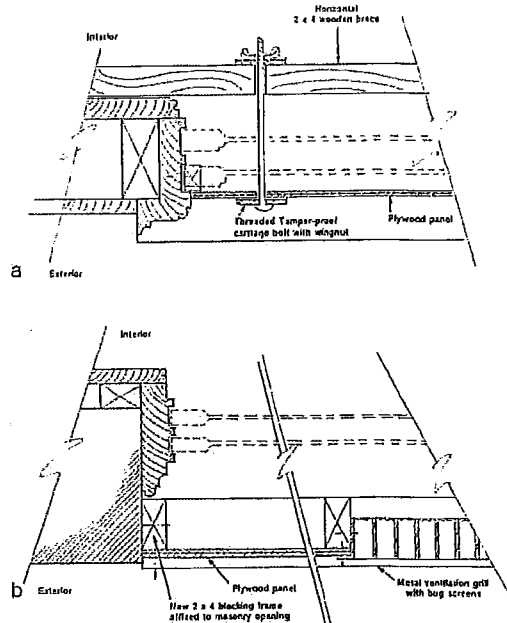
A: Plan detail showing plywood security panel anchored with carriage bolts through to the inside horizontal bracing, or strong backs. B: Plan detail showing section of plywood window panel attached to a new pressure treated wood frame set within the masonry opening. Ventilation should be included whenever possible or necessary.
